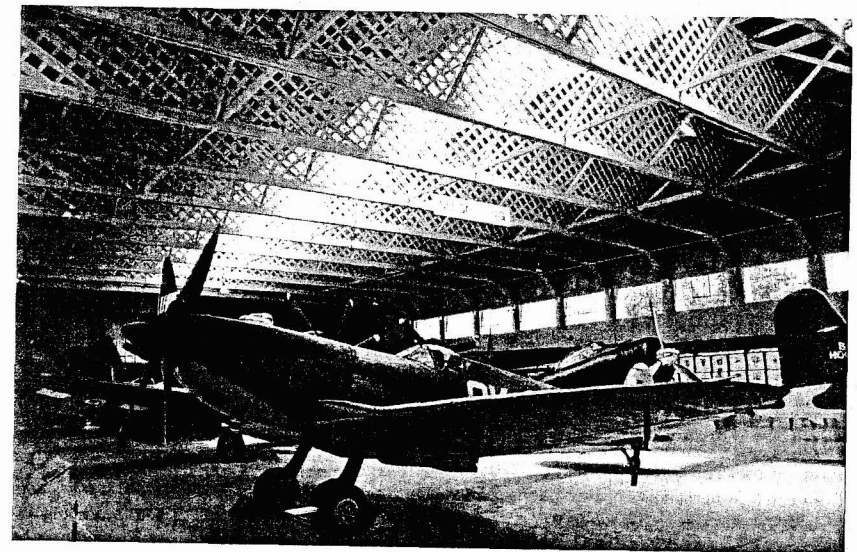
Belfast truss used in a First World War hangar at Duxford, Cambridgeshire (photo: S. Gilbert).
